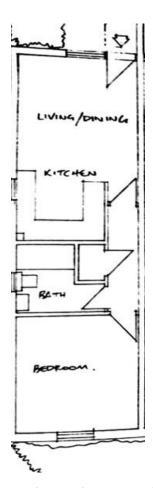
Plan of typical flat, No. 124 (CHS papers)
